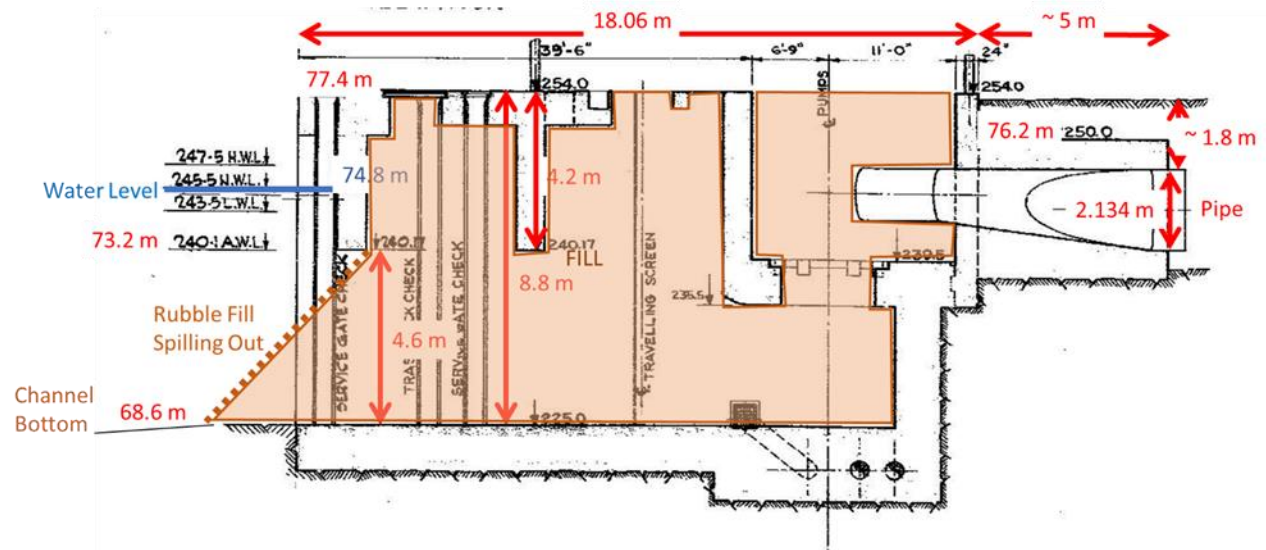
Schematic cross-section of Pumphouse 3 showing rubble fill (brown shading) inside pumphouse and spilling out from pumphouse (dashed brown line) onto intake channel bottom
